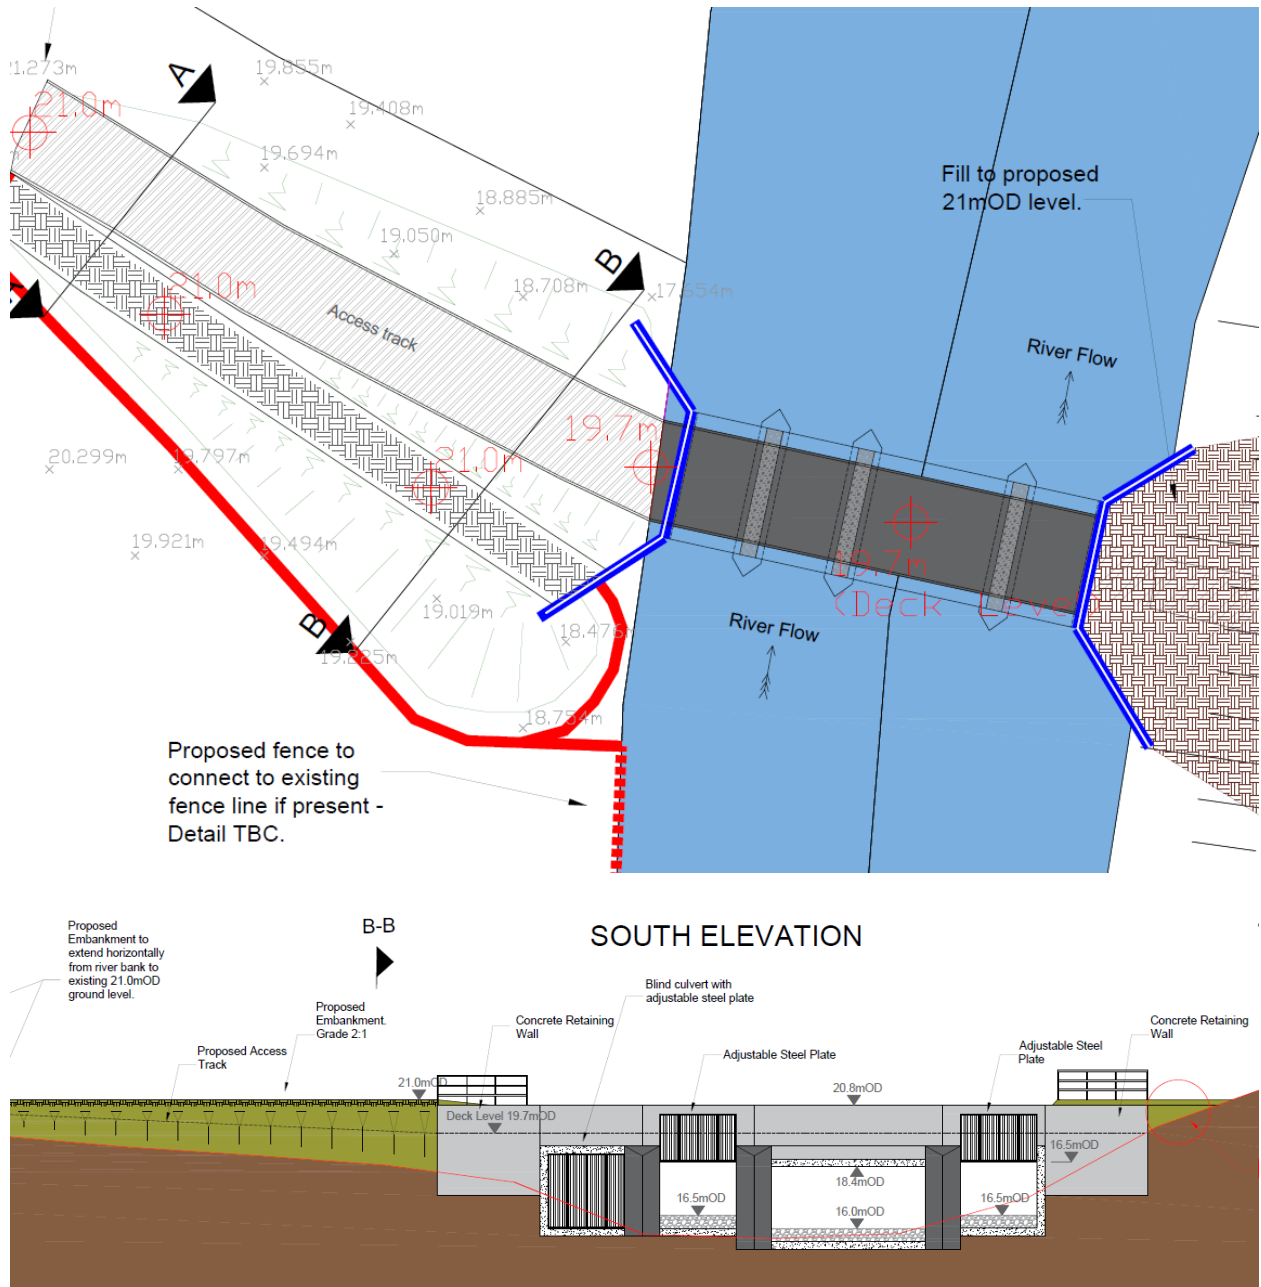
Plan View and Cross-Section of Flow Control structure with adjustable gates (extract from Ryan Hanley Scheme Drawings entitled River Flow Control Structure and Embankment)
